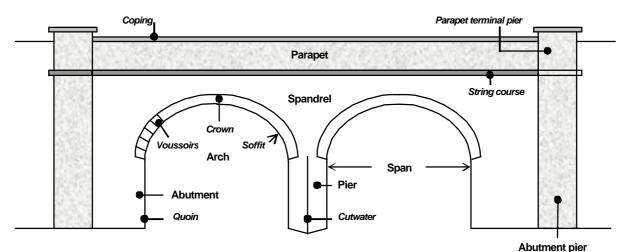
Principal elements of a typical masonry arch bridge carrying a road or railway over a river.
